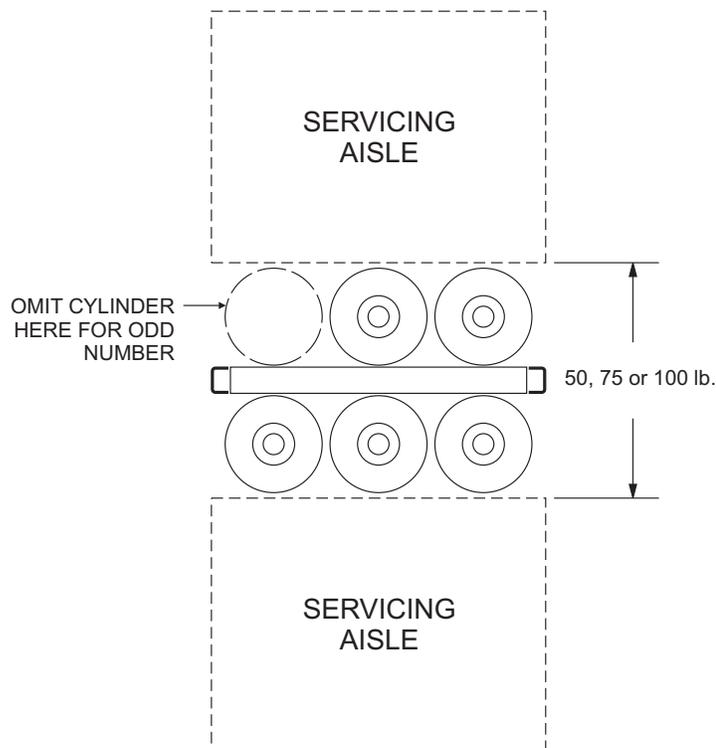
Multiple Cylinder Mounting, Arrangement B
